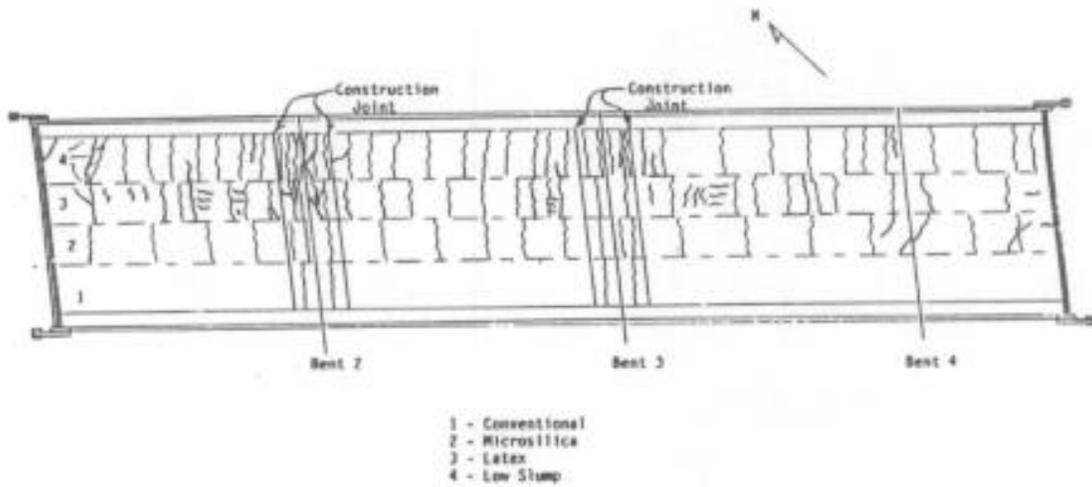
Overlay Cracks in Haynes Bridge Rd.
